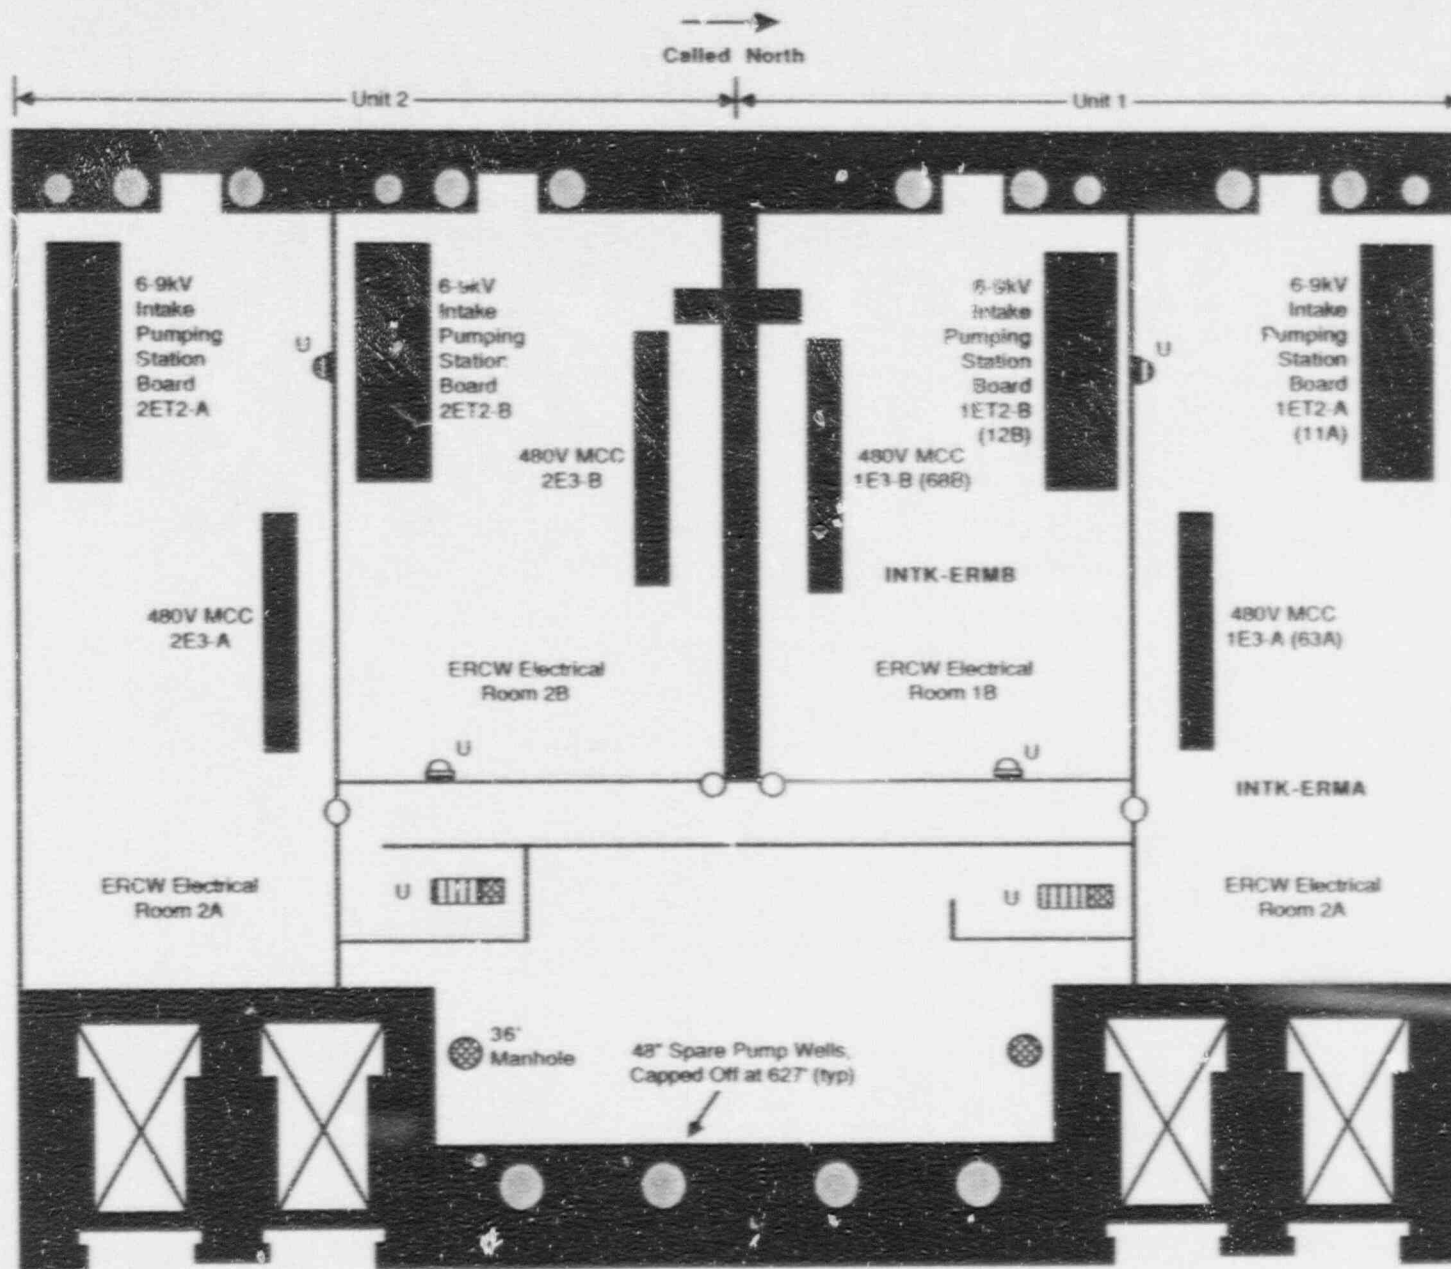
Bellefonte 1 and 2 Intake Pumping Station, Elevation 607'-0"
